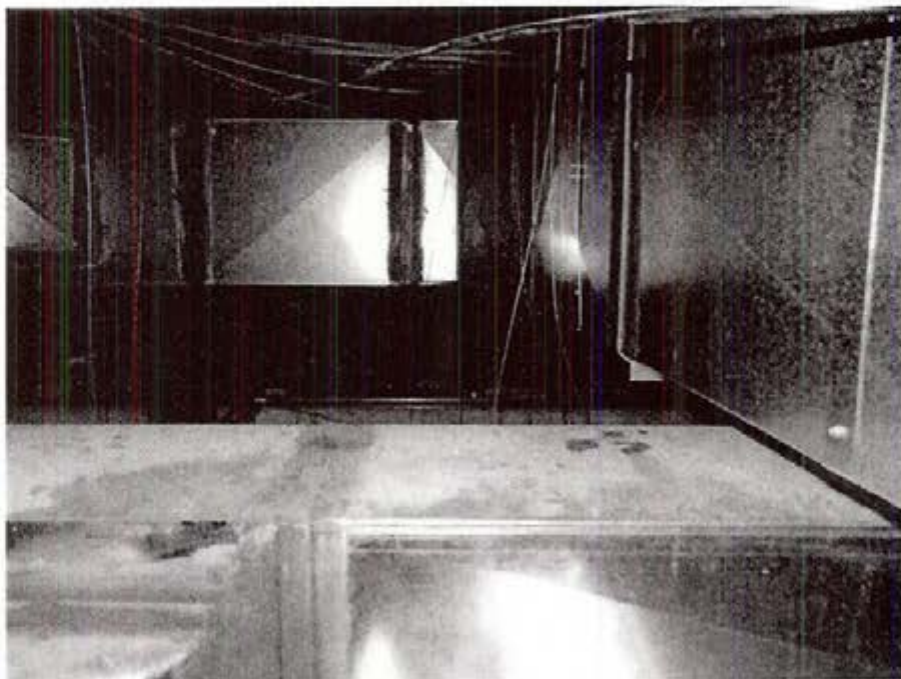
Lead wipe sample (042414-IFR-W-10) collected from the top of a metal duct; above the drop ceiling of the copy room.
